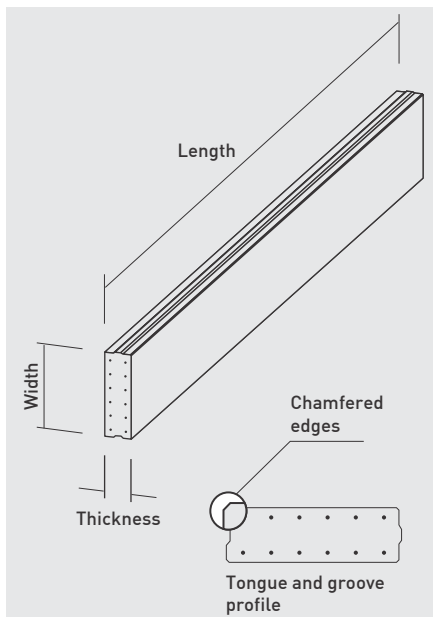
Hebel® Wall Panel (AAC steel reinforced element).
